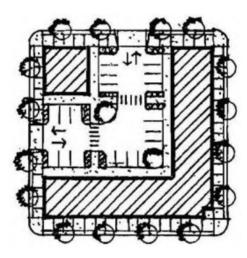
(B) Surface Parking – Parking Area Interior to Site
